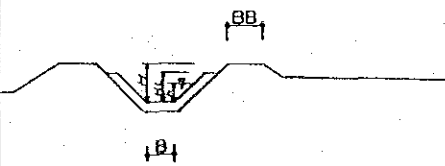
PLAN AND PROFILE OF ESC\_2 (2/2)
